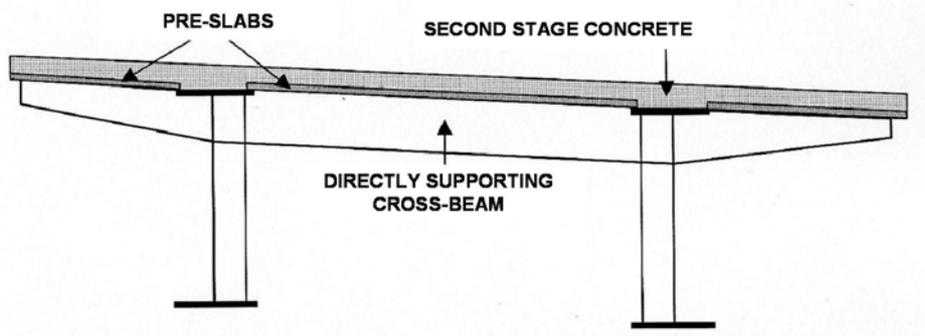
Twin girder directly supporting cross-beam deck formed by pre-slabs
